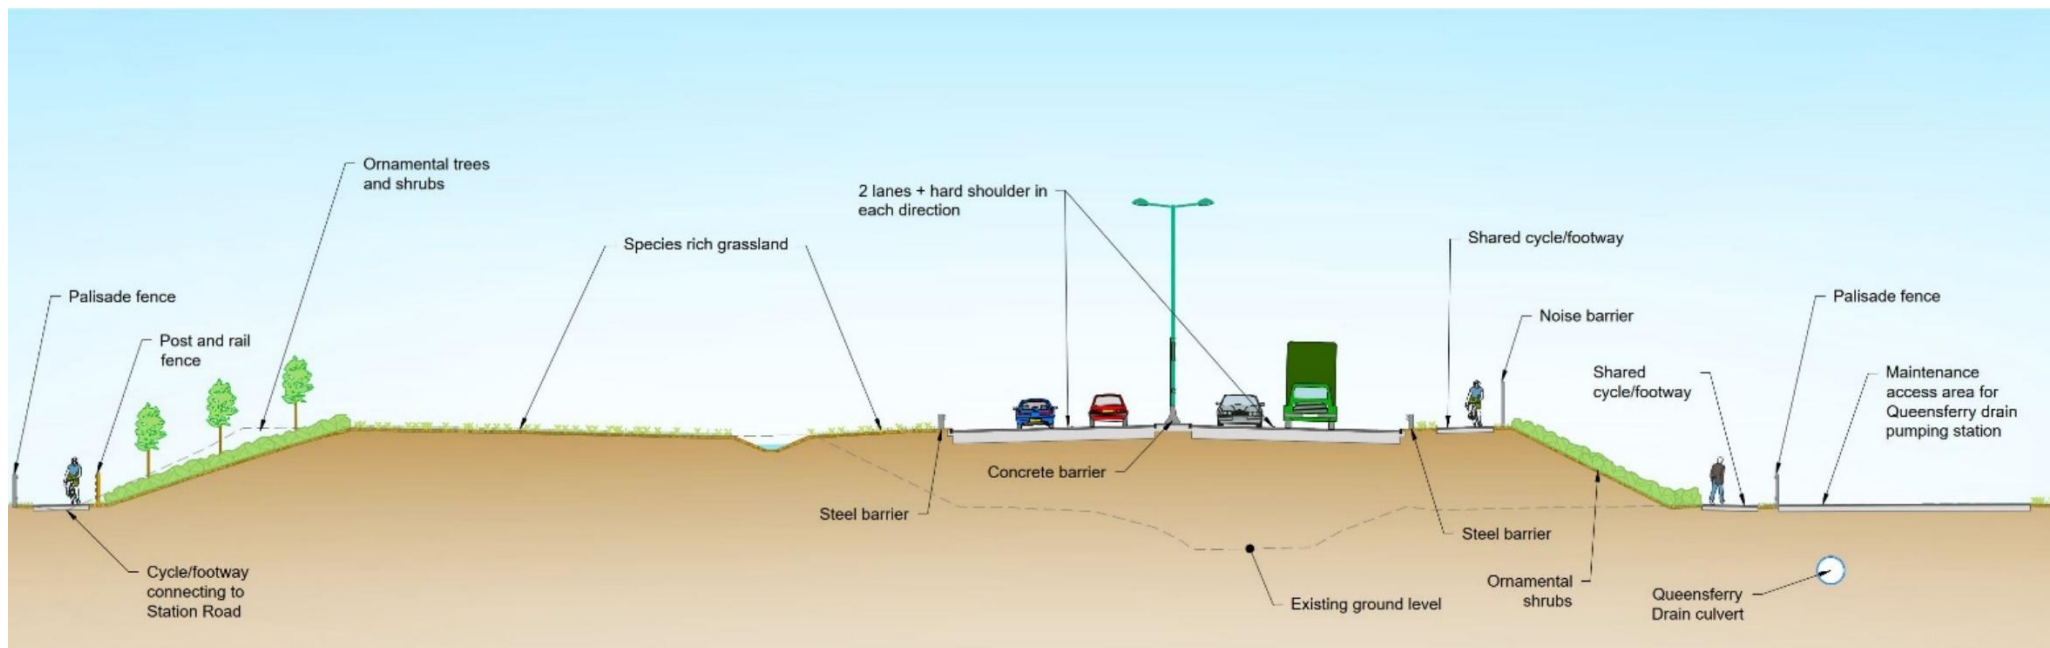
Typical cross section through the new highway embankment area on the approach to the river bridge facing north east (Source: Mott MacDonald)
